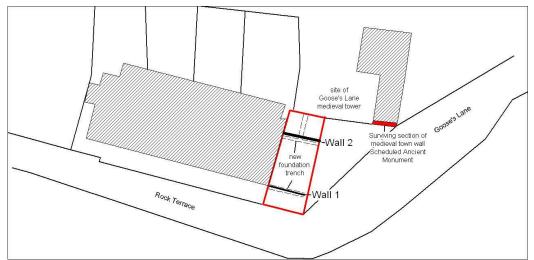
Plan of new foundation trenches and old wall lines (heavy black lines) encountered during the watching brief.
